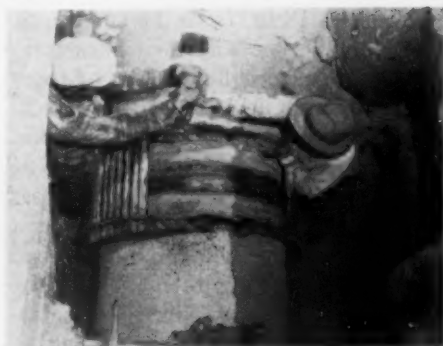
Placing Form for Mortar Collar to Cover Enamel Coating at Joints
